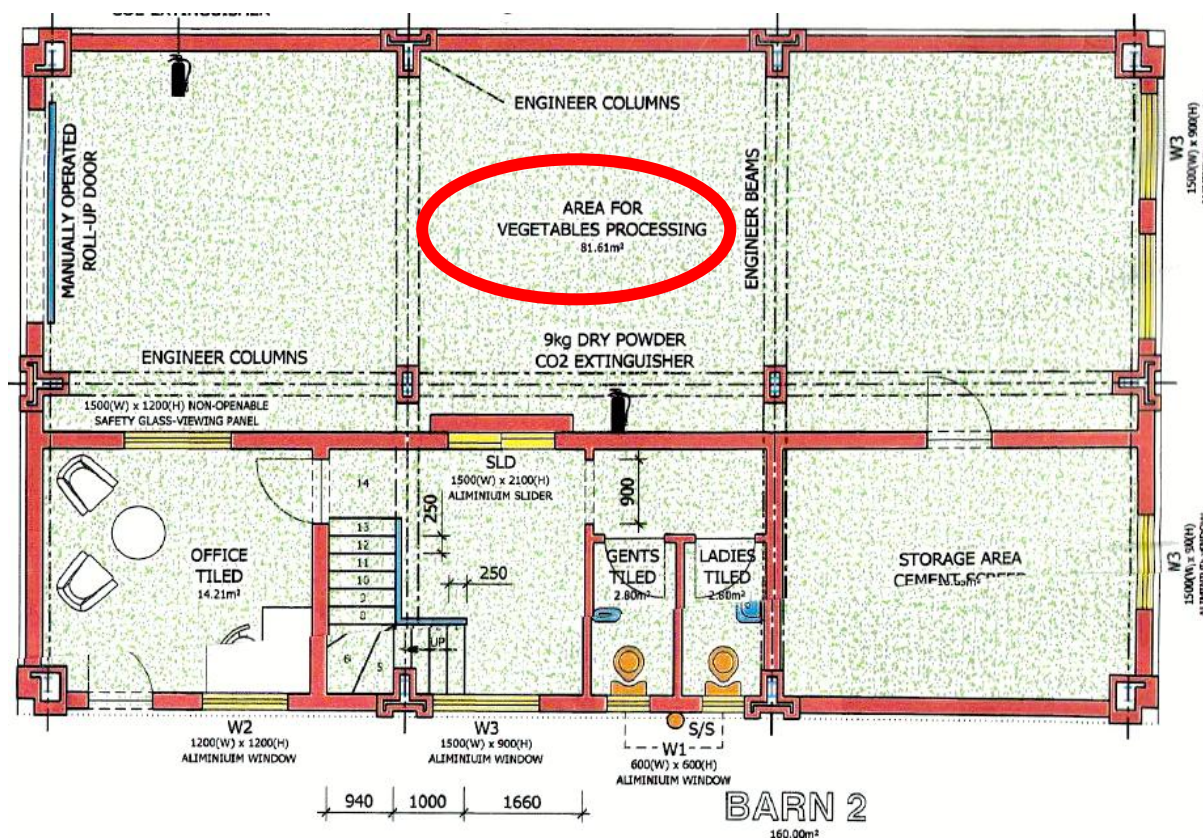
Barn 2 - Extract from 2013 approved building plans
